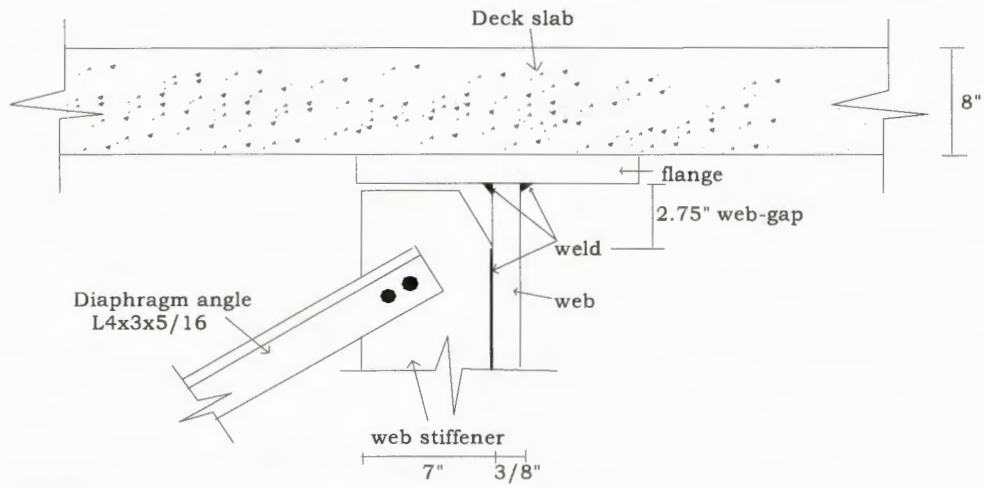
Details of stiffener-web connection in the negative moment region (Adapted from Iowa DOT-Highway Division design details, File no. 25779, Sheet no.36)
